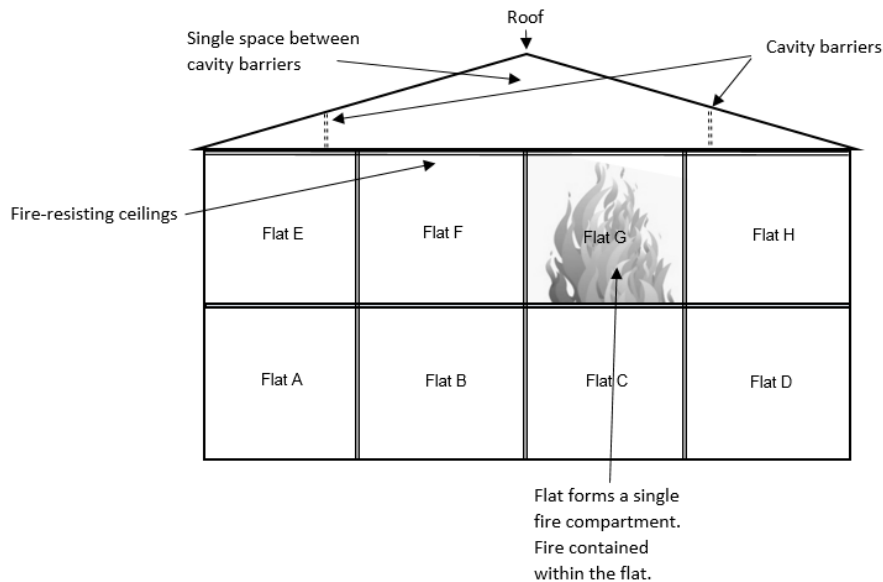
Fire Resisting Ceiling and Cavity Barriers in Roof Void
